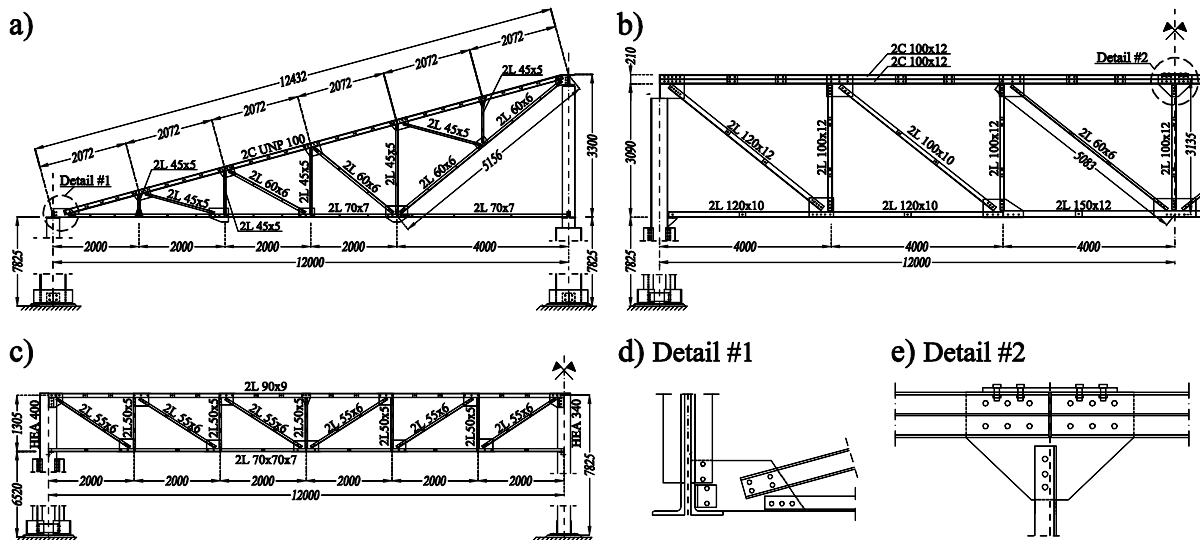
Sample structural cross-sections of trusses in direction X (a) and Y (b, c); sample (qualitative) details of roof member joints (d).
